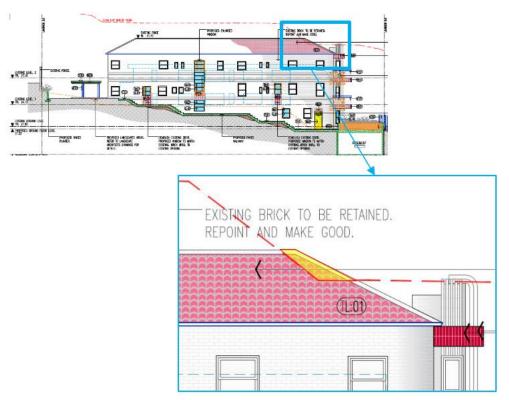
Height of building variation shown on north elevation (shaded in yellow)
